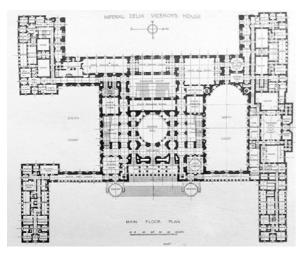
"Imperial Delhi –Viceroy's House" Main Floor Plan Drawing
